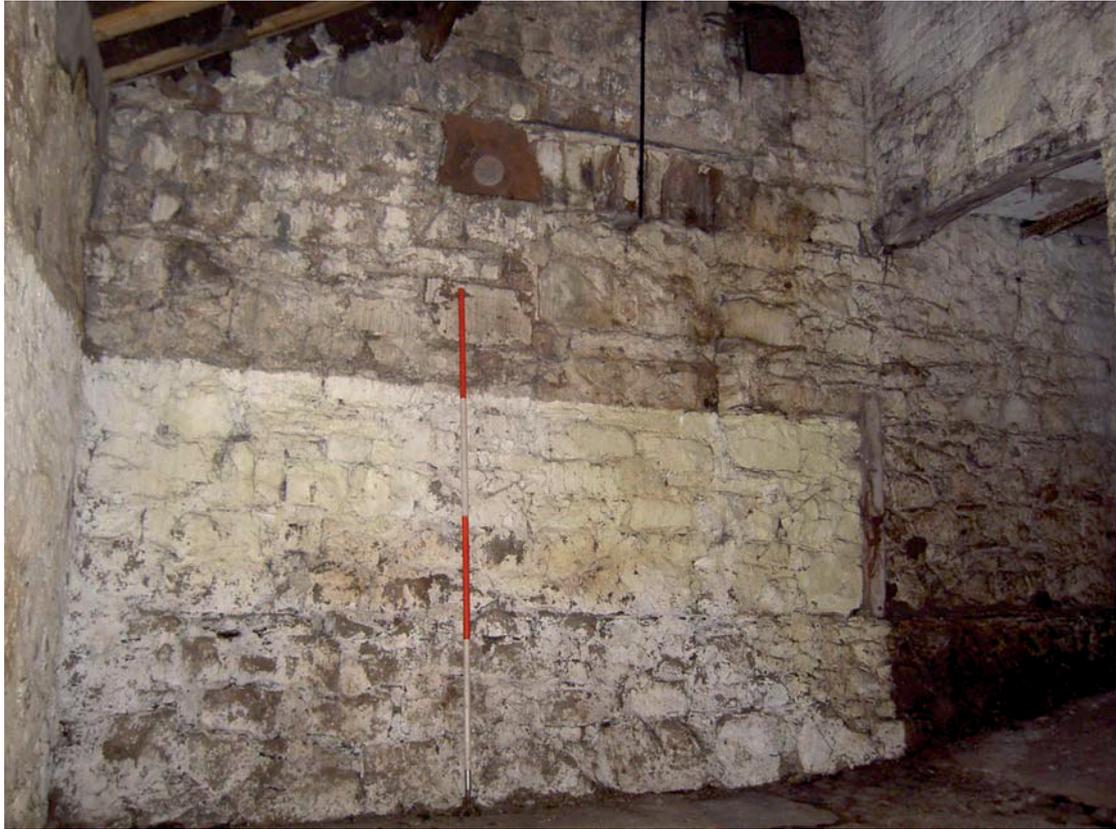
Outshut 4a showing blocked window in east elevation of Building 3
